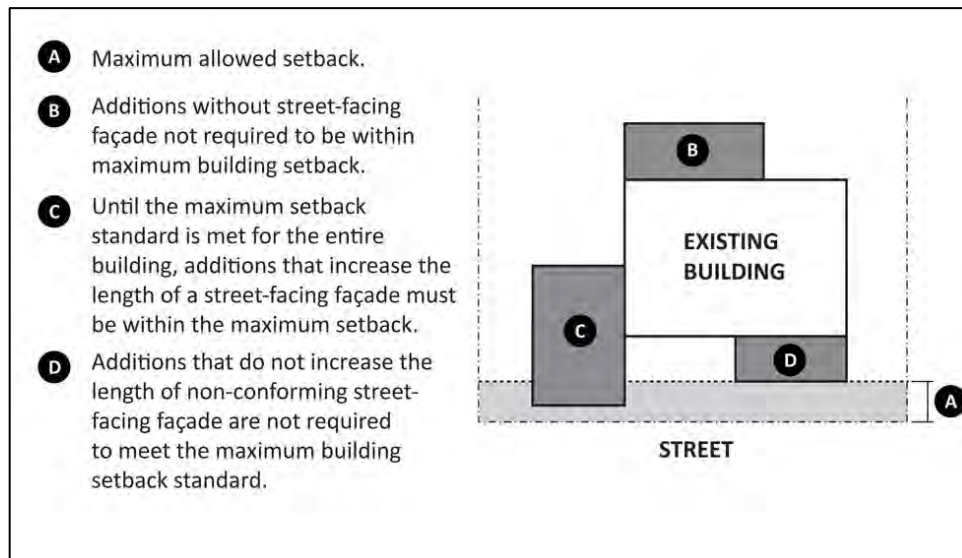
Building Orientation and Alterations to Existing Buildings
